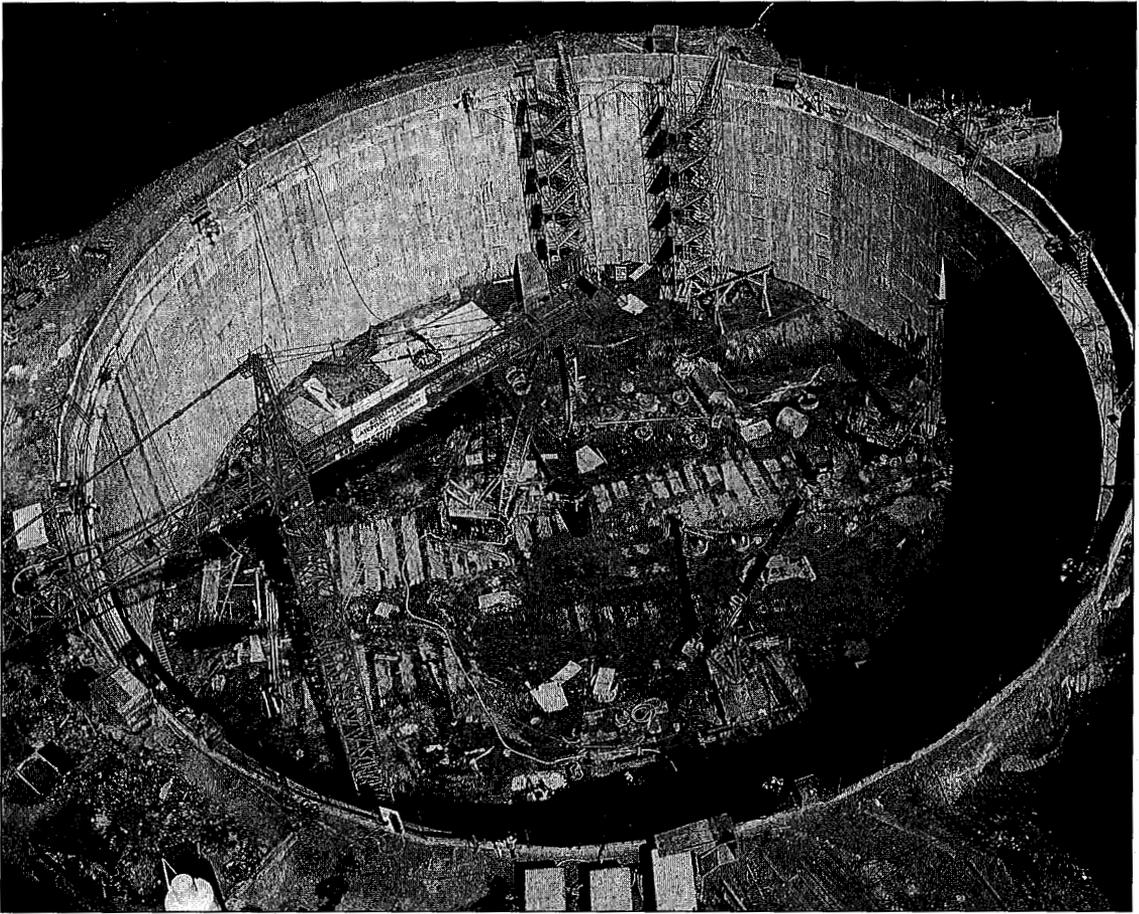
Construction of the cofferdam cylinder is complete. The outline of the varying ring beam thicknesses indicates the north opening is to the right. Installation for the ventilation building caissons has begun.
